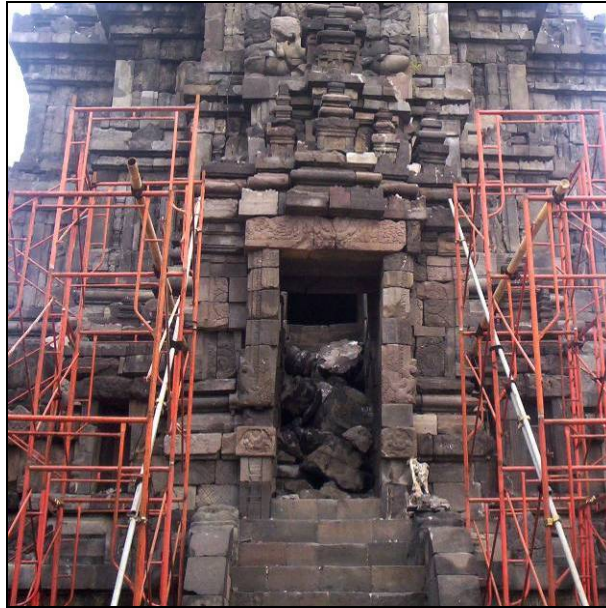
Evidence of internal heavy damage; stones shown on the staircase
